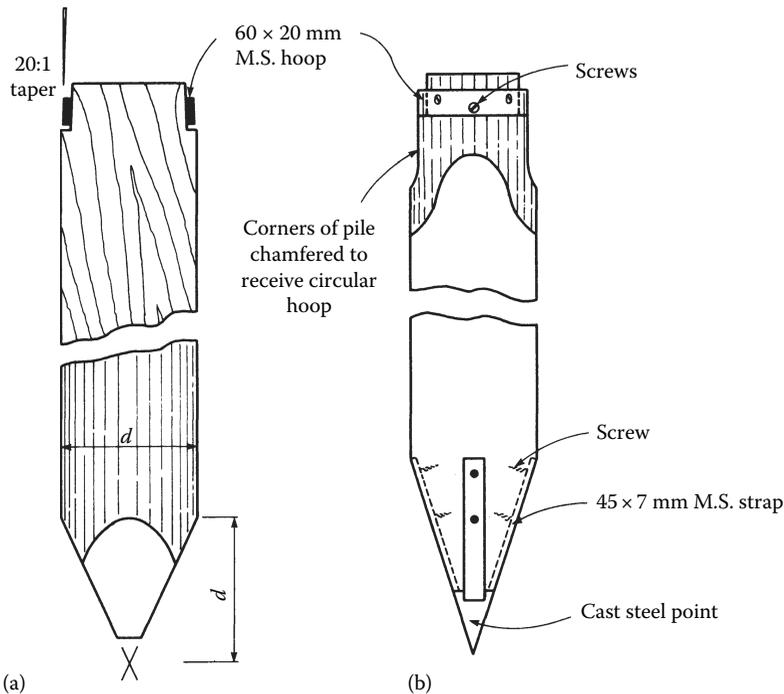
Protecting timber piles from splitting during driving. (a) Protecting head by mild steel hoop. (b) Protecting toe by cast-steel point.
